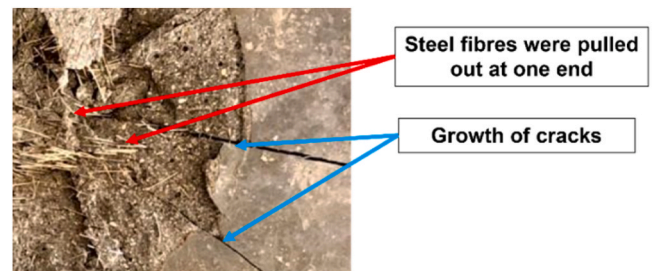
Fibre fracture shape on the rear face following an impact test.
